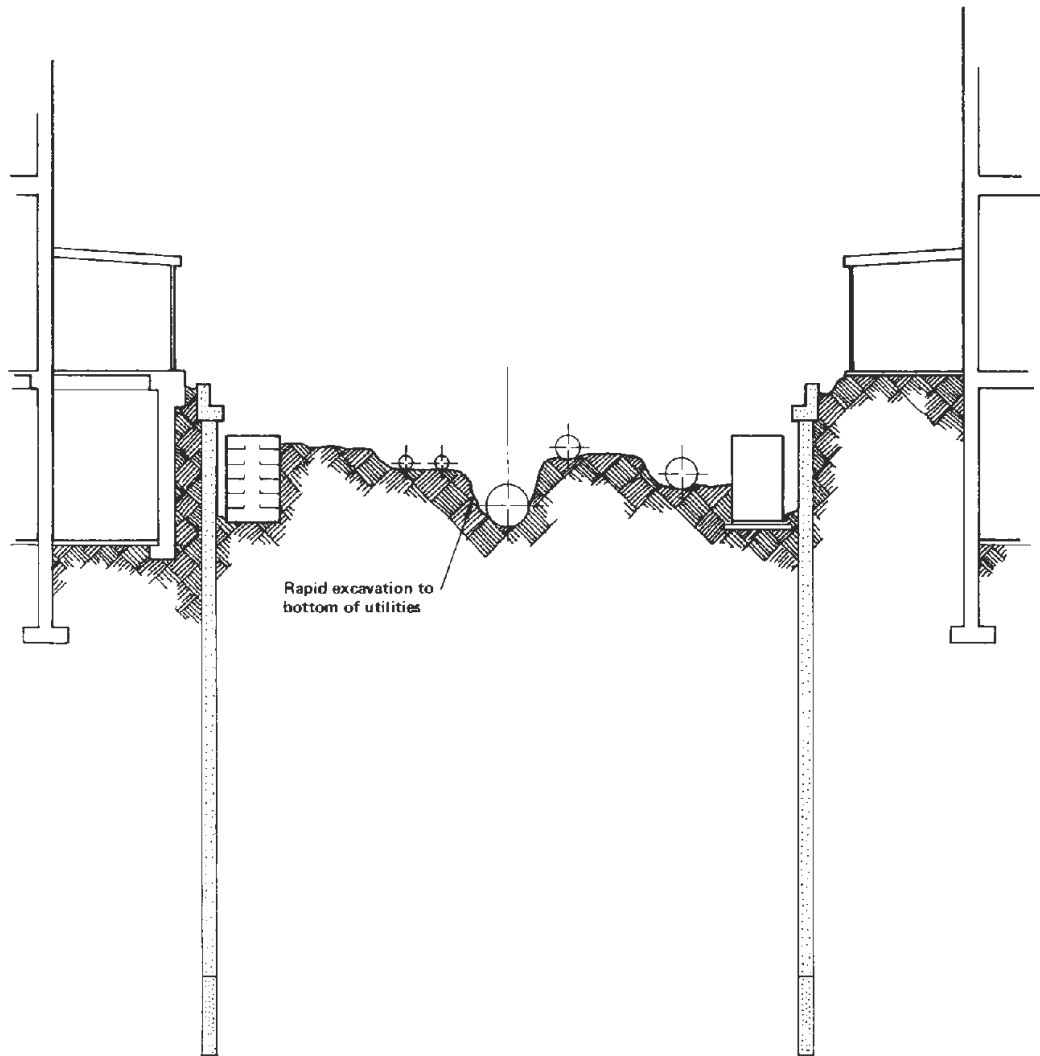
Step 9: Close down street and rapidly excavate to underside of utilities.
